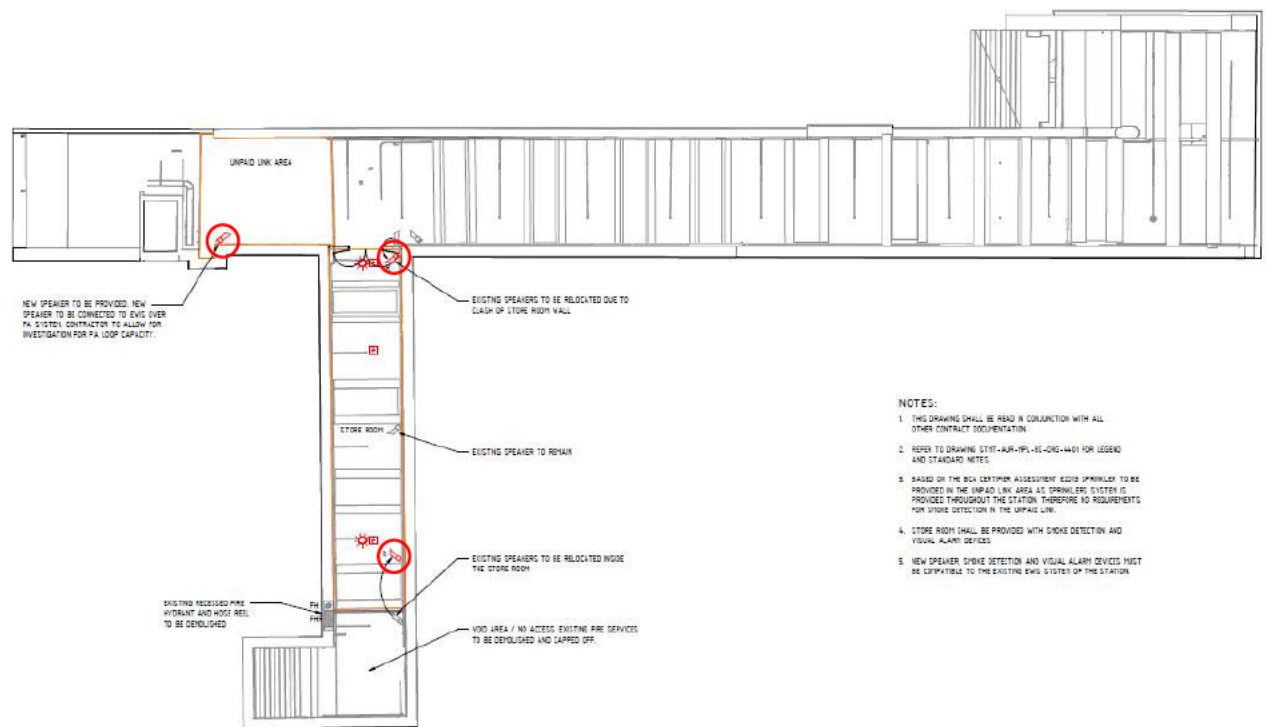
Dry fire proposed plan – new locations for speakers circled in red. Source: Transport for NSW 2024
